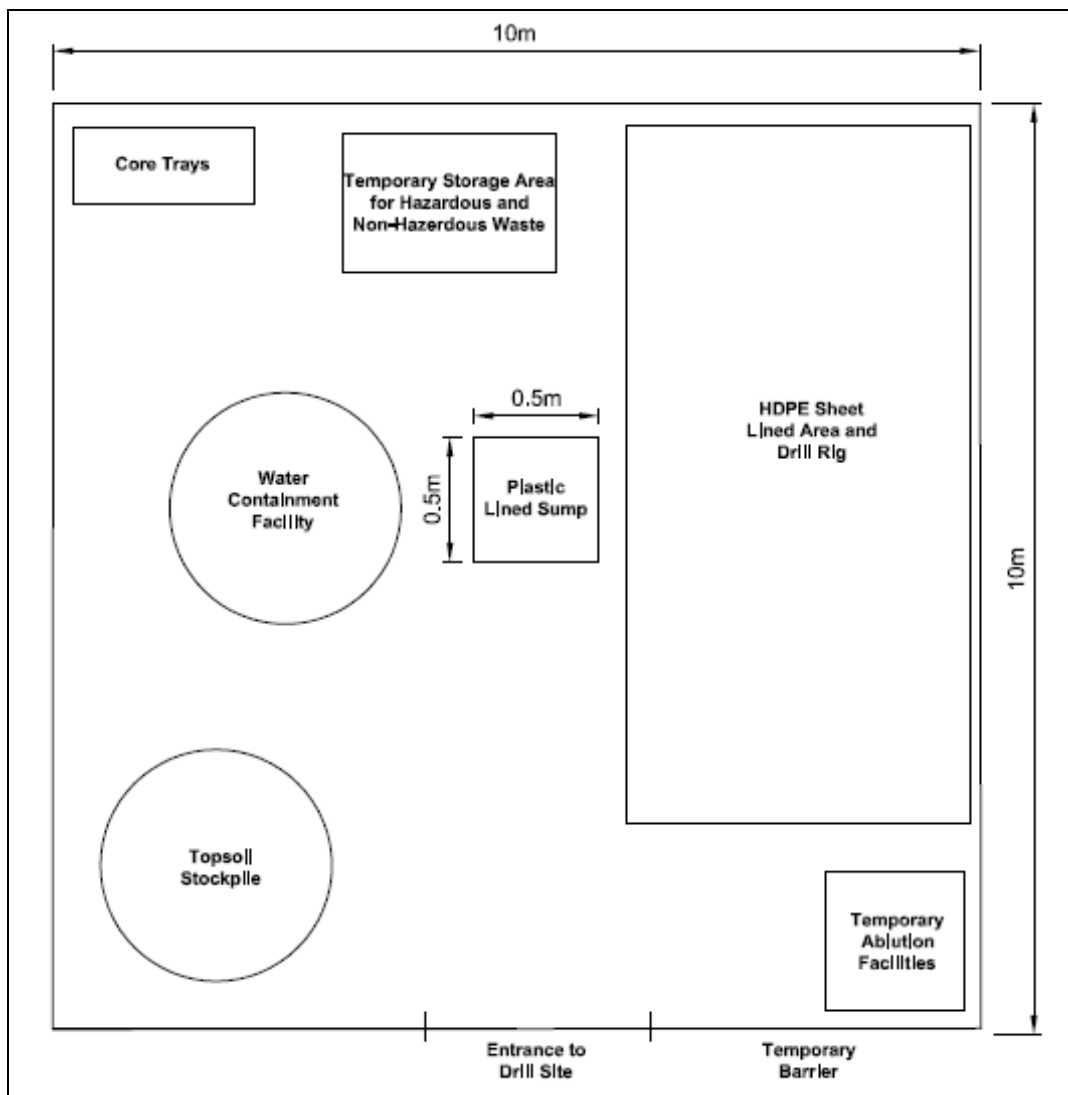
Conceptual layout of a drill site (SLR, 2019)
